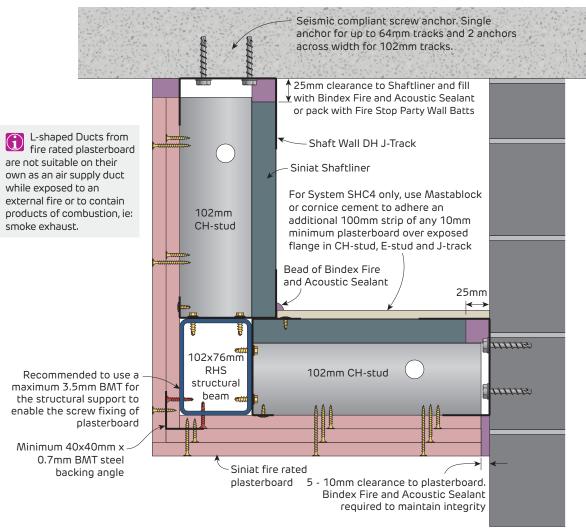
Shaft Wall L-shaped Duct with RHS Structural Beam SHW2 and SHC4 Section
